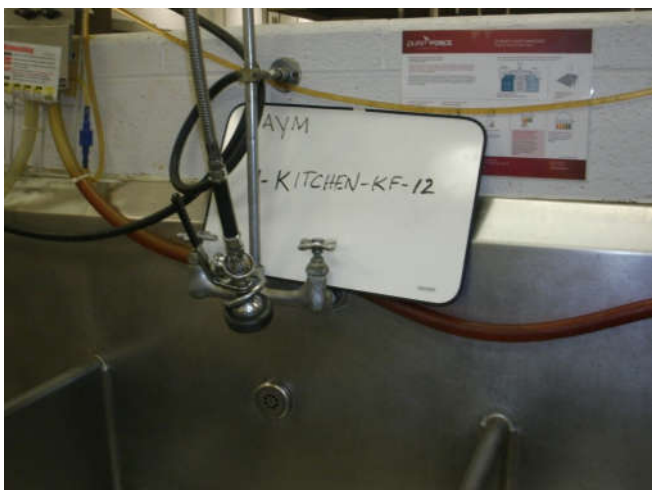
Kitchen faucet, located on the 1st floor, in the kitchen (room 138) – center fixture (dish washing).
